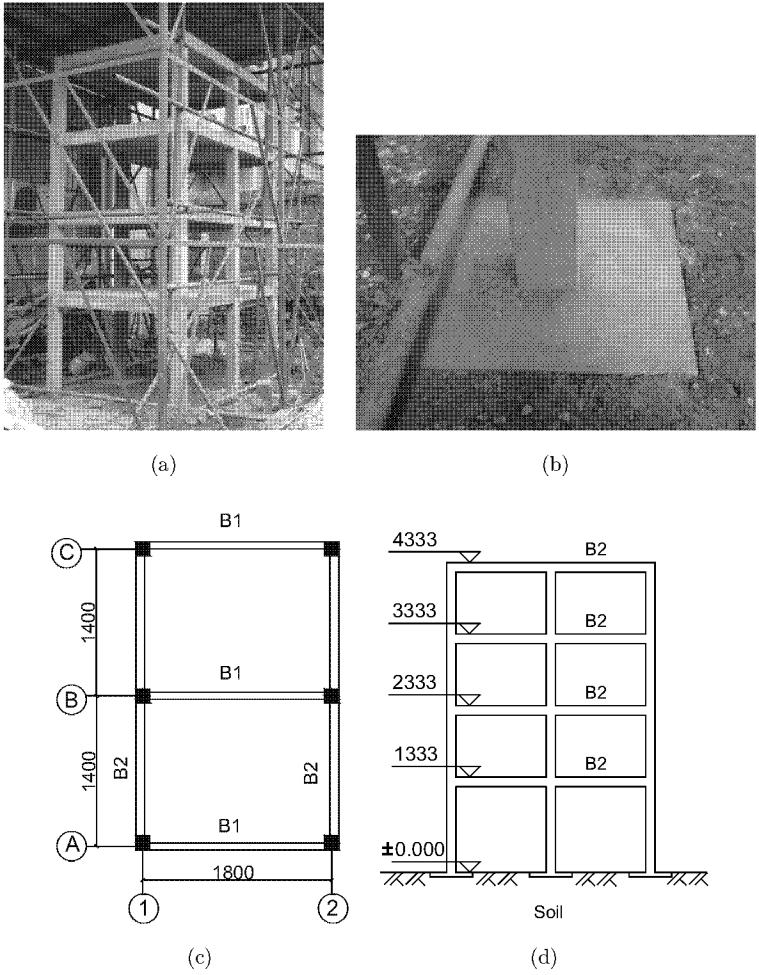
Frame configuration: (a) photo of model frame structure; (b) photo of embedded isolated footing; (c) plane view and dimensions; (d) elevation of North–South frames (all dimensions are in mm).
